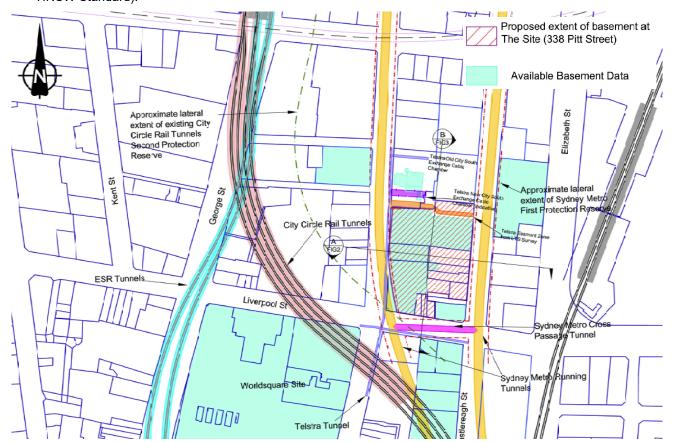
City Circle and Sydney Metro Tunnels Site Plan
